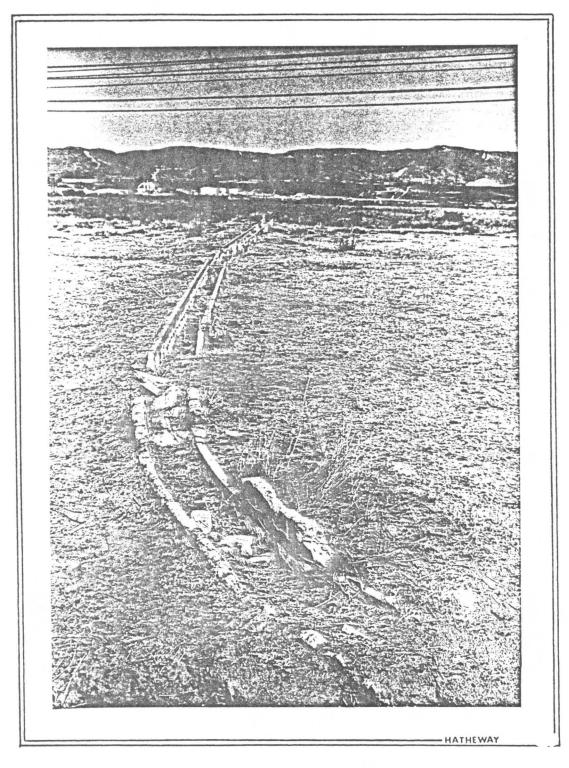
PROJECT AREA IRRIGATION CANAL #3
